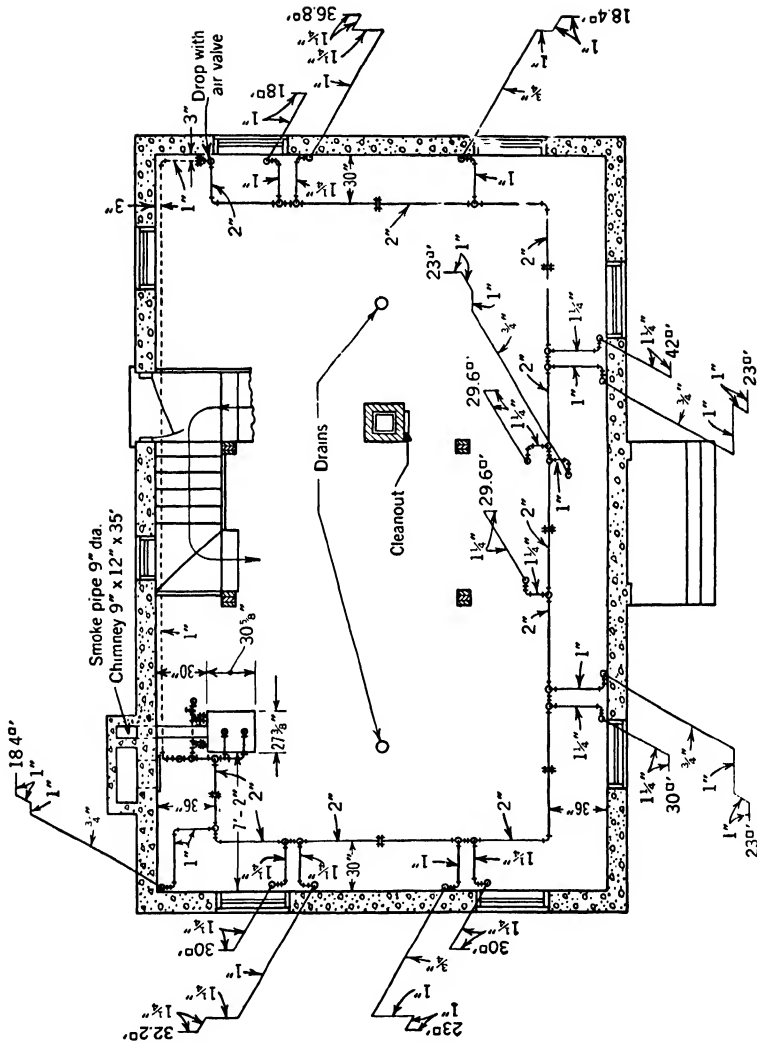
Basement plan of a one-pipe steam heating system for a residence.
